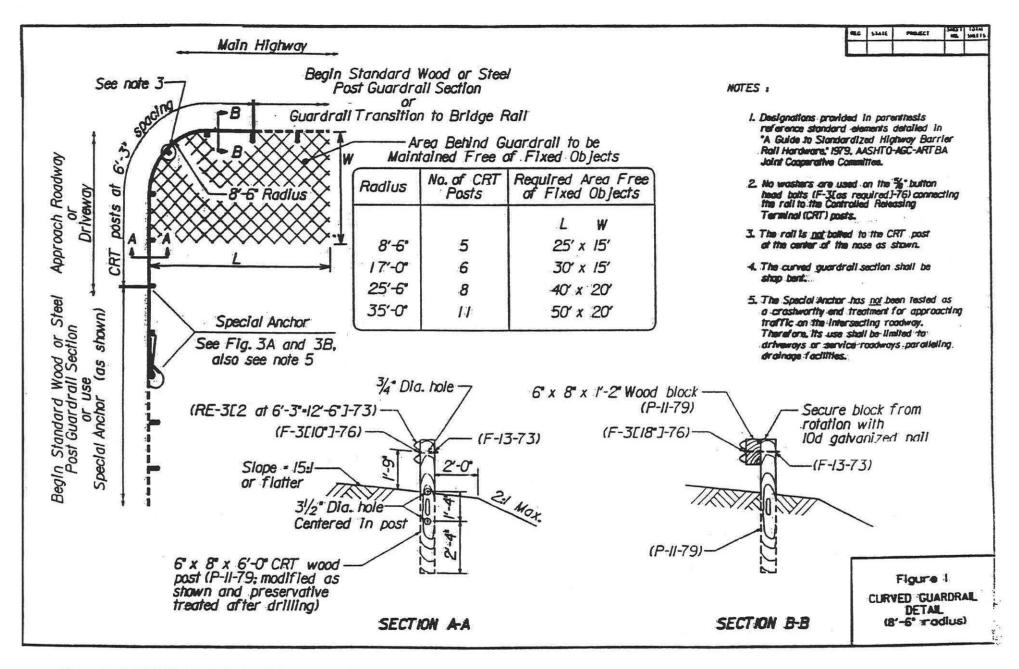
FHWA Technical Advisory Drawings for Short Radius Guardrail Designs (9)
